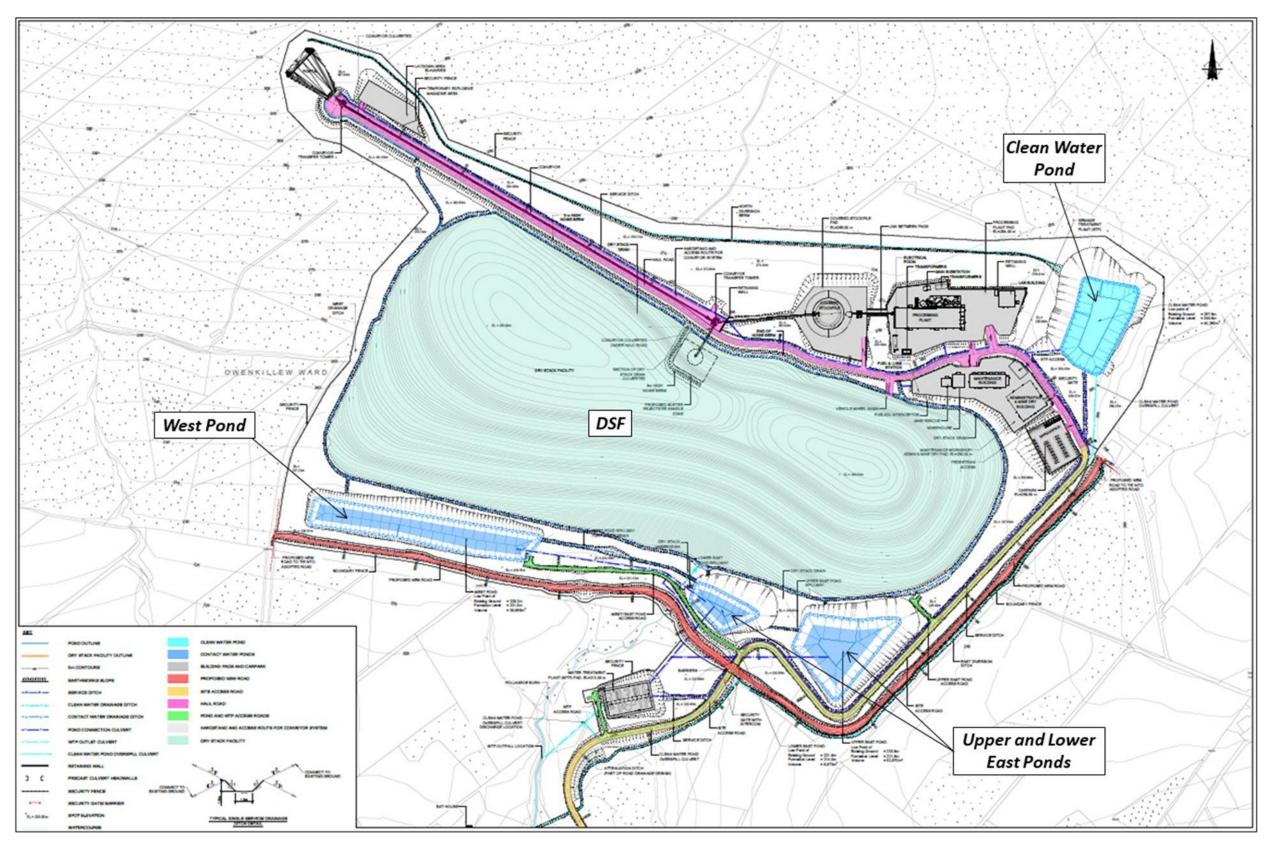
Proposed Infrastructure Site (Hoy Dorman Drawing 2016021-P-CIV-004 (A) General Site Layout Plan)
